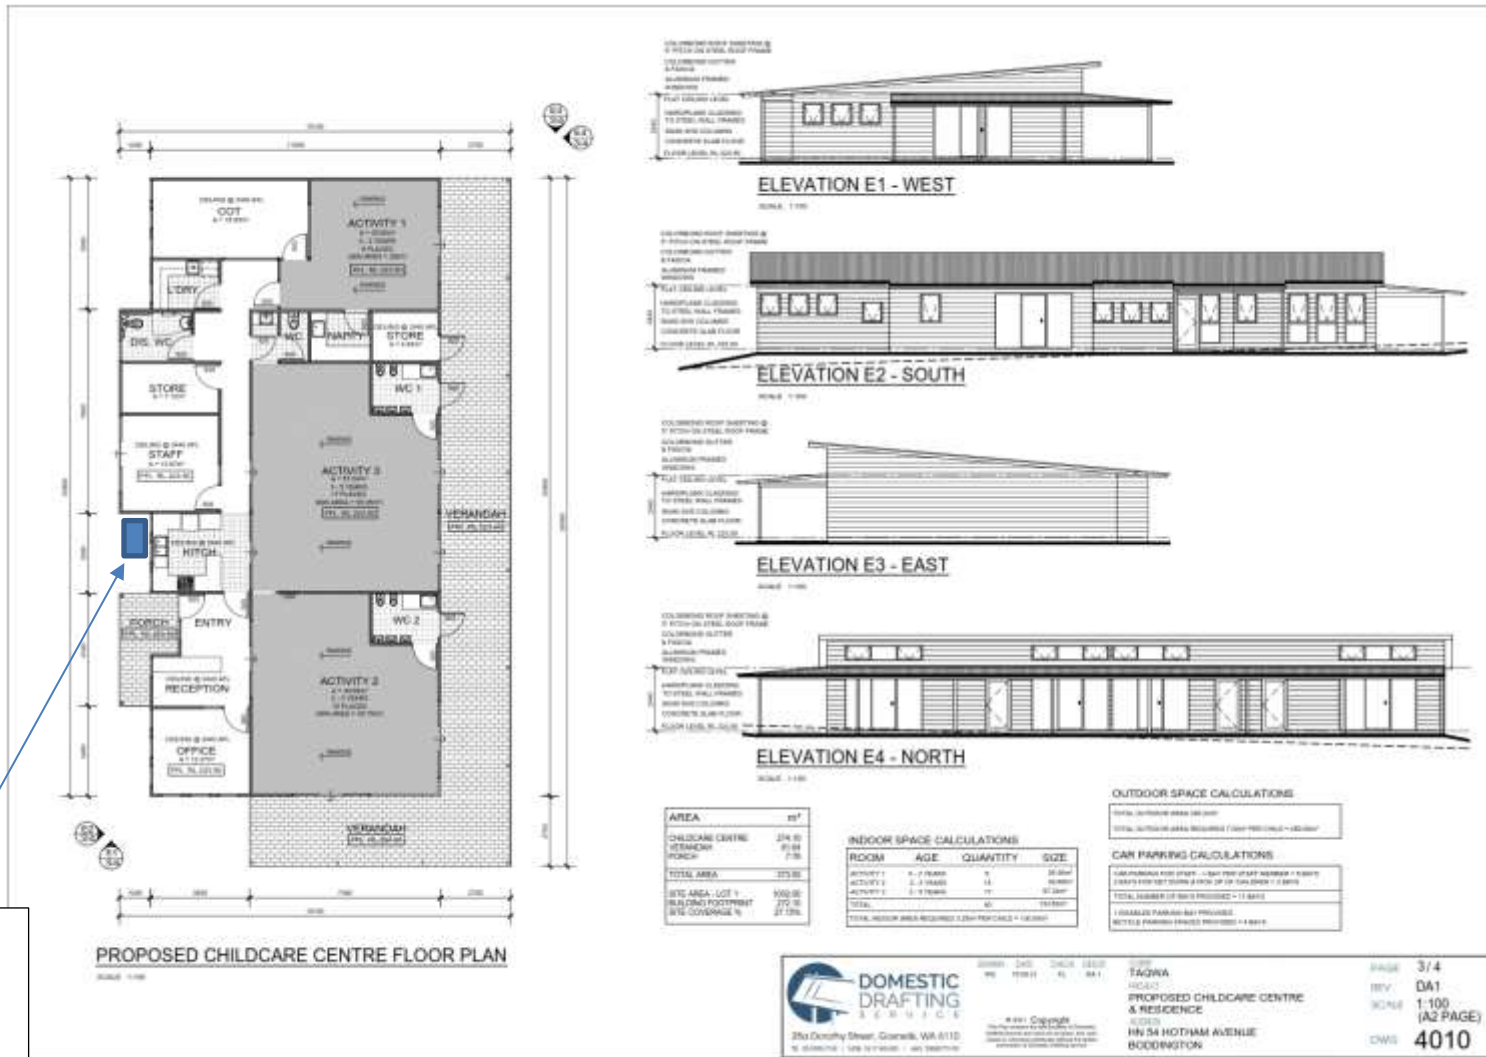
Proposed Building Layout and Elevations (source: Domestic Drafting Service)
